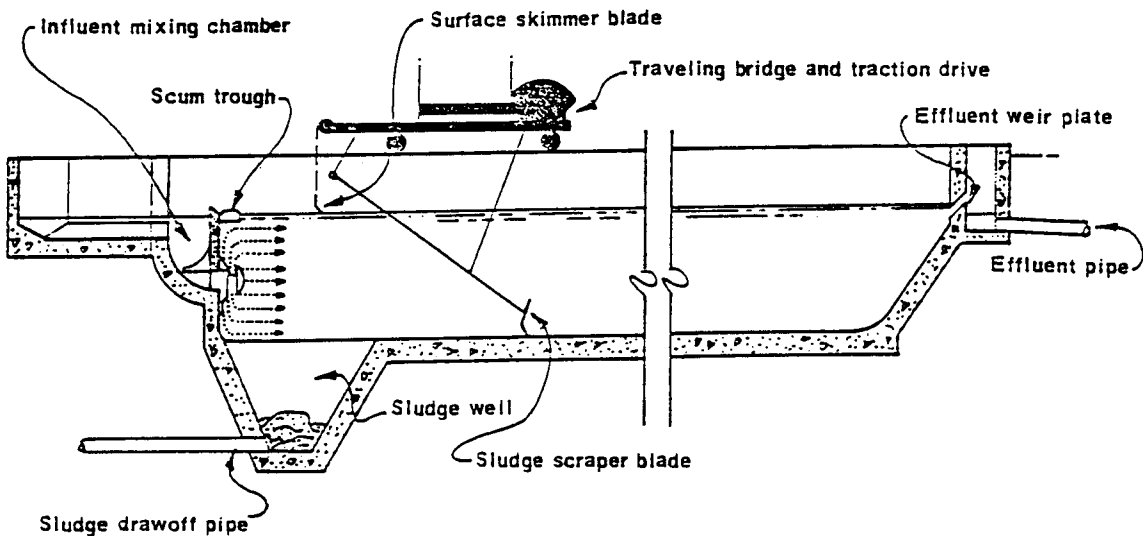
Rectangular sedimentation tank, traveling bridge collector
